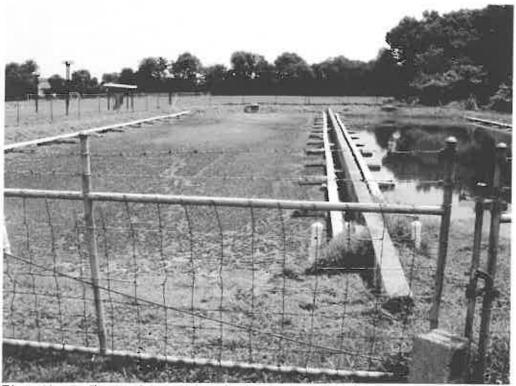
Photo of the wastewater treatment system's sand filters located near the property's south boundary.
